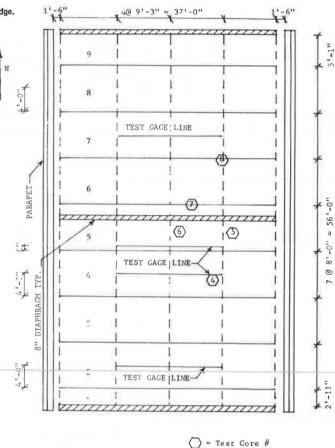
Location plan of gages for span 11R of Peace River Bridge.
